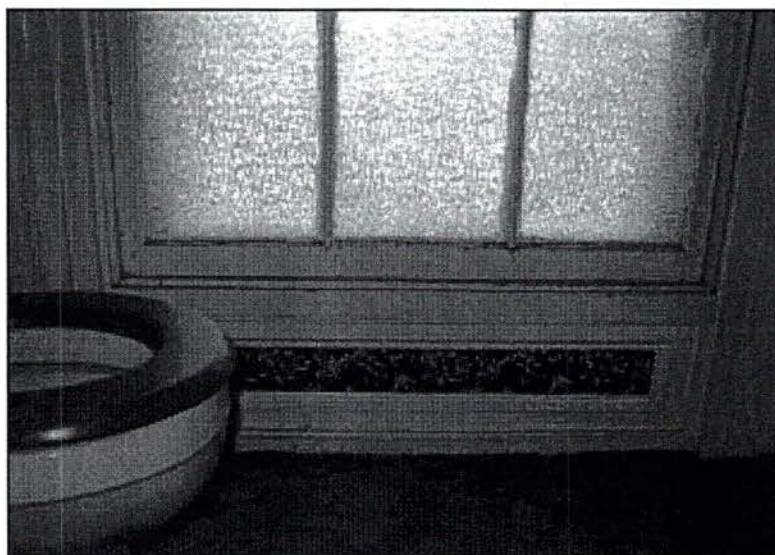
Detail of the wood skirt under window in Room 201. All of the east facing windows of the second floor have the wood skirts.
